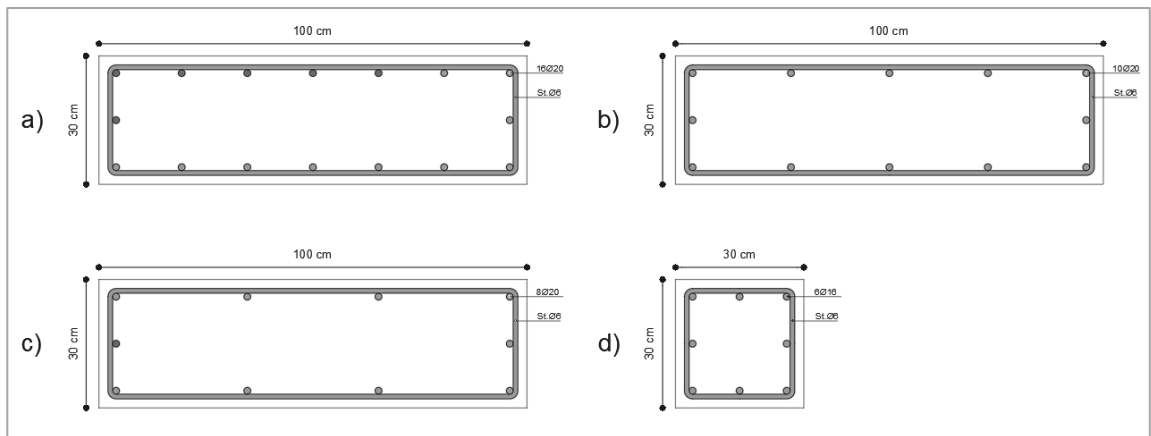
Column type “C – 2” reinforcement details, a) used in floor 1-4, b) used in floor 5, c) used in floor 6 and d) used in floor 7 of E Template (Durrës) building
